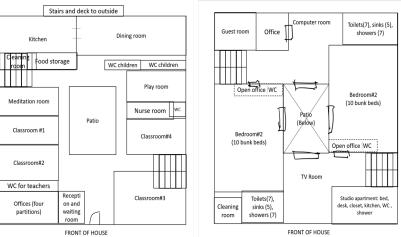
Client's Vision for the Facility – Plans of, First Floor (on left), Second Floor (on right)
